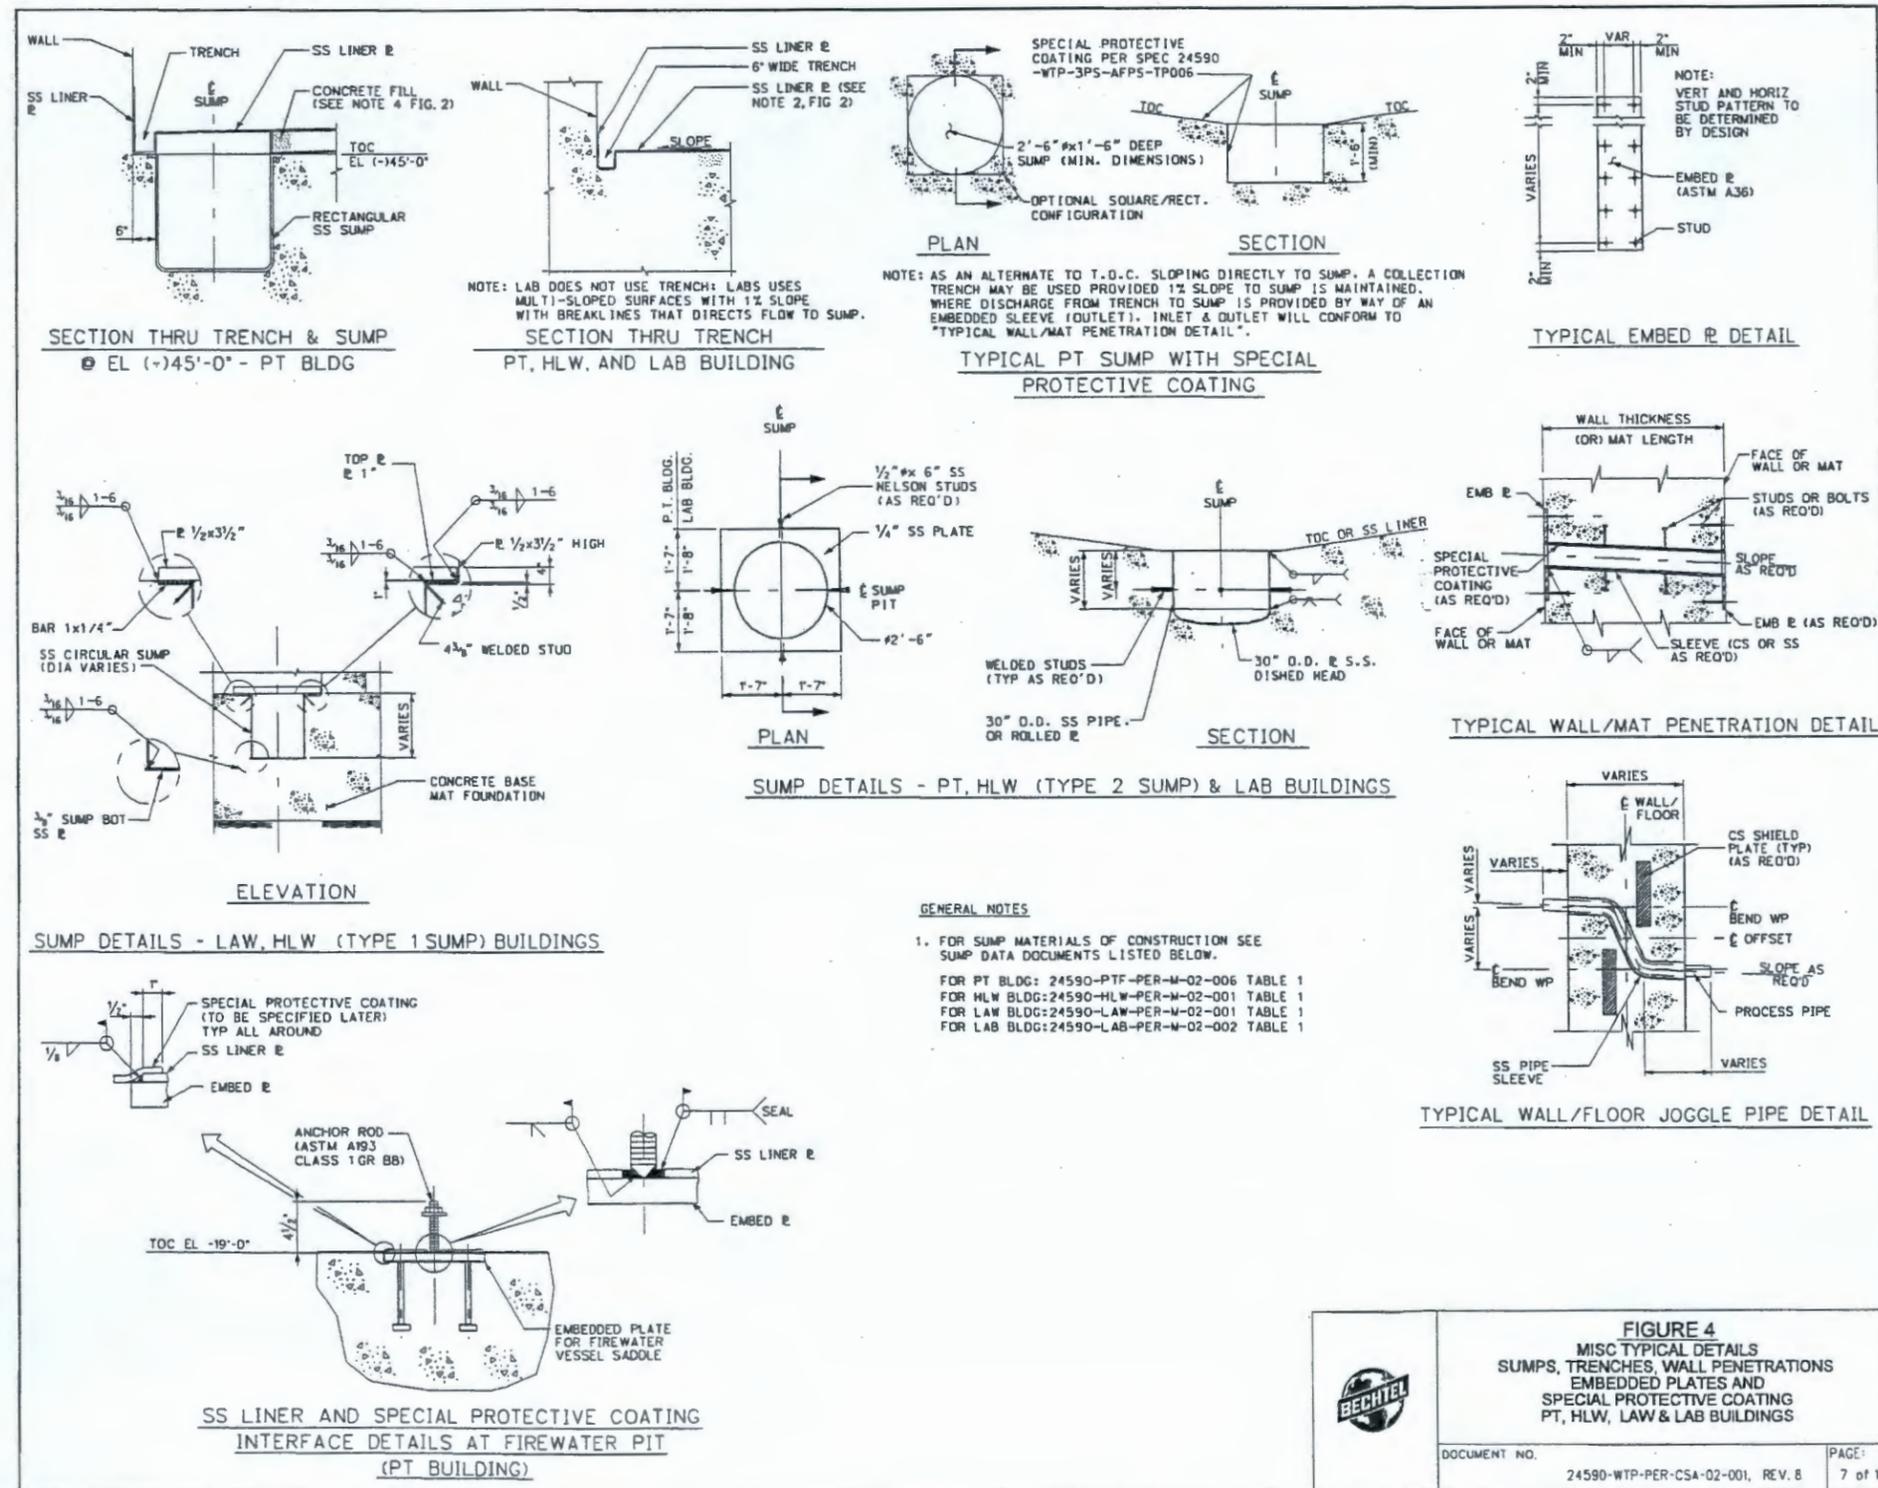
Misc. Typical Details Sumps, Trenches, Wall Penetrations, Embedded Plates and Special Protective Coating PT, HLW, LAW and LAB Buildings
